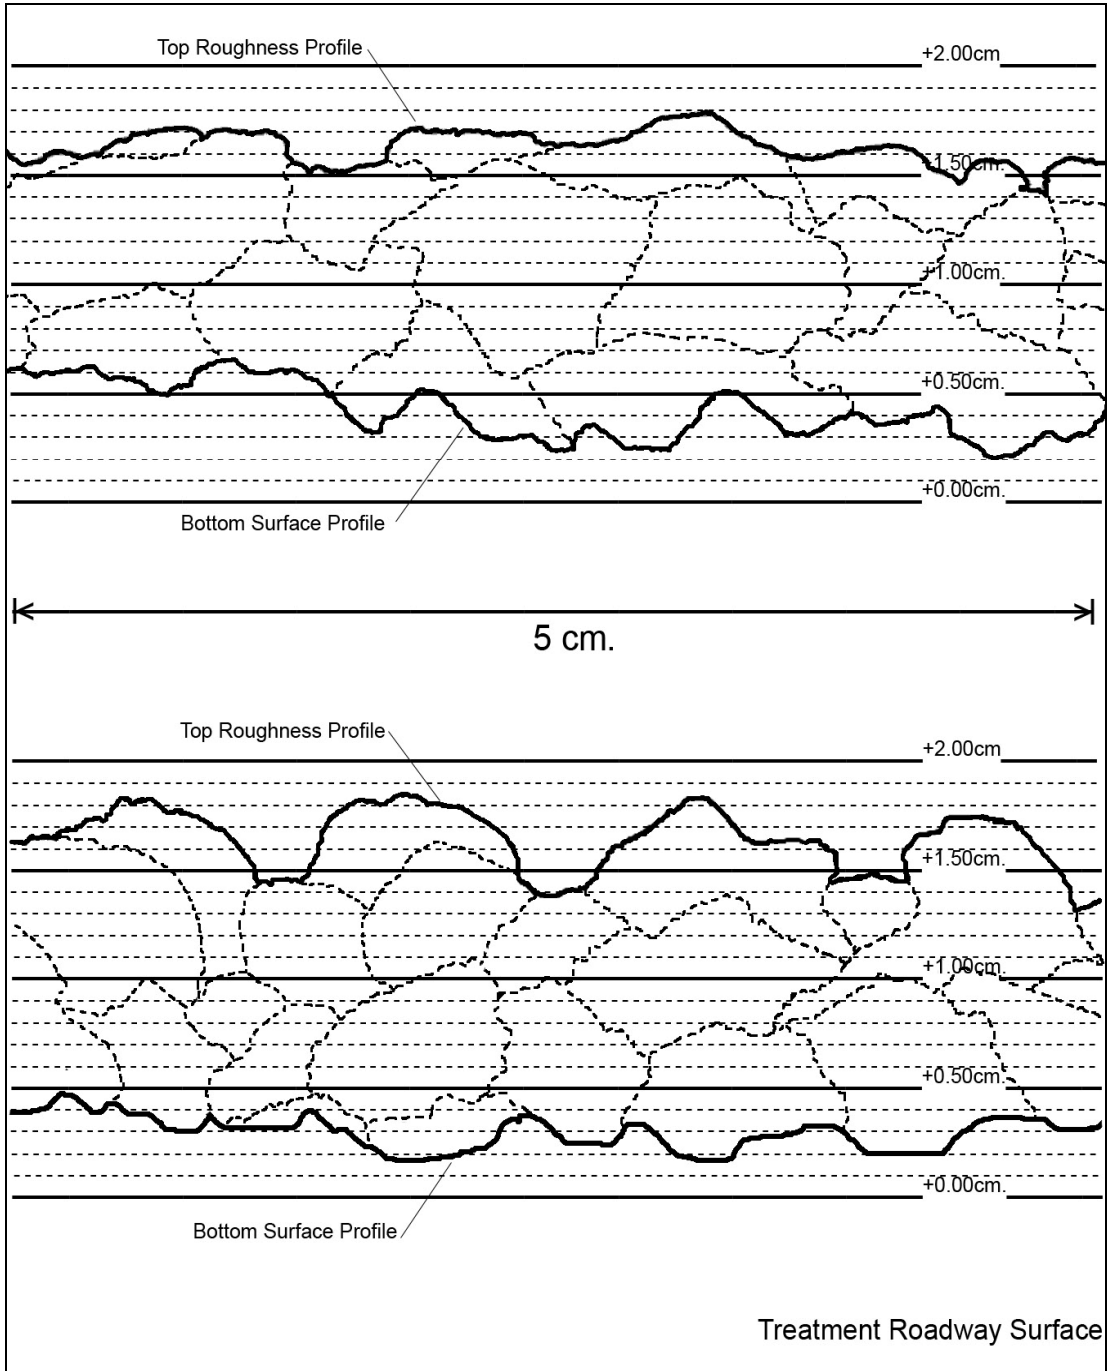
Longitudinal asphalt treatment roadway surface profiles
